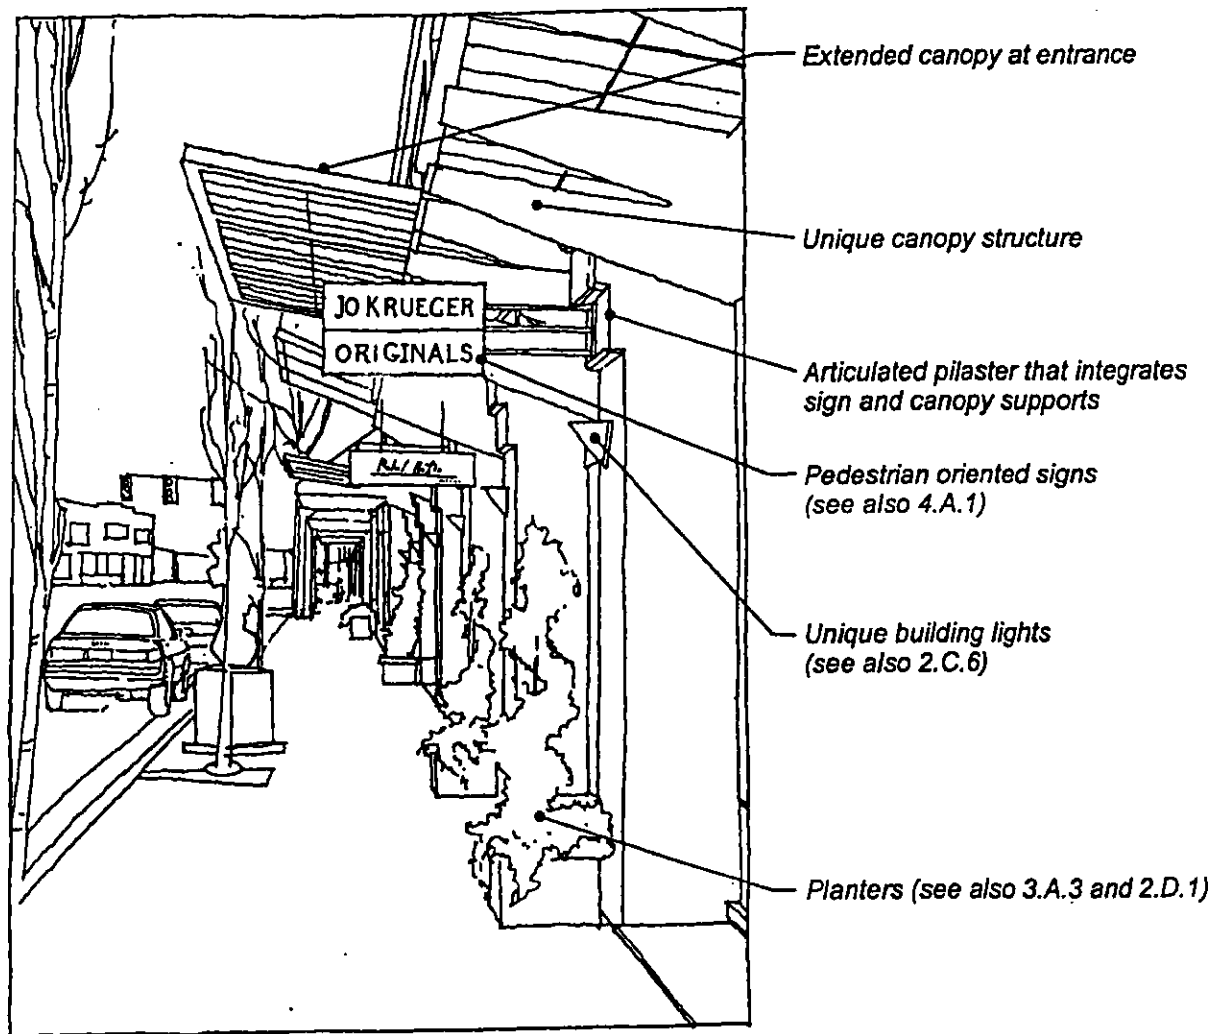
C.3: Examples of the use of appropriate architectural elements and details. Note how the details complement one another and create a pedestrian scaled sidewalk space.
